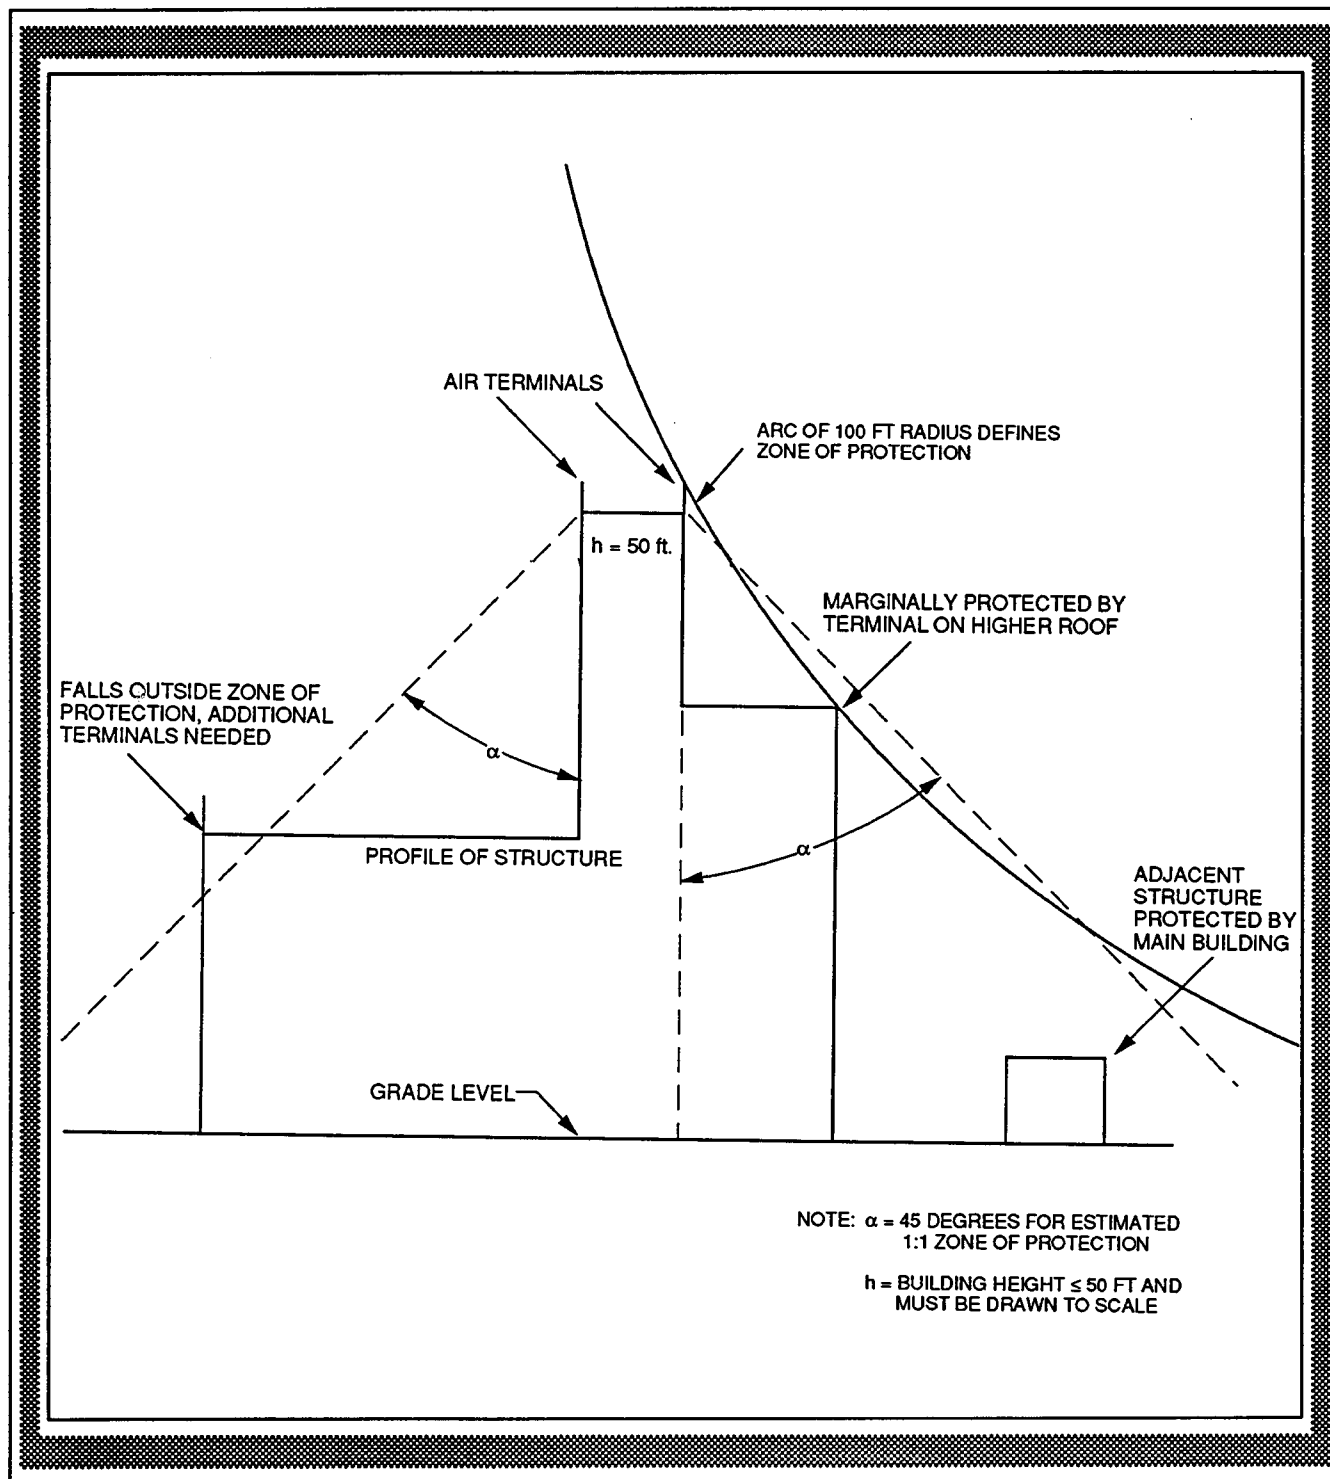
DETERMINING AIR TERMINALS FOR TOWERS
